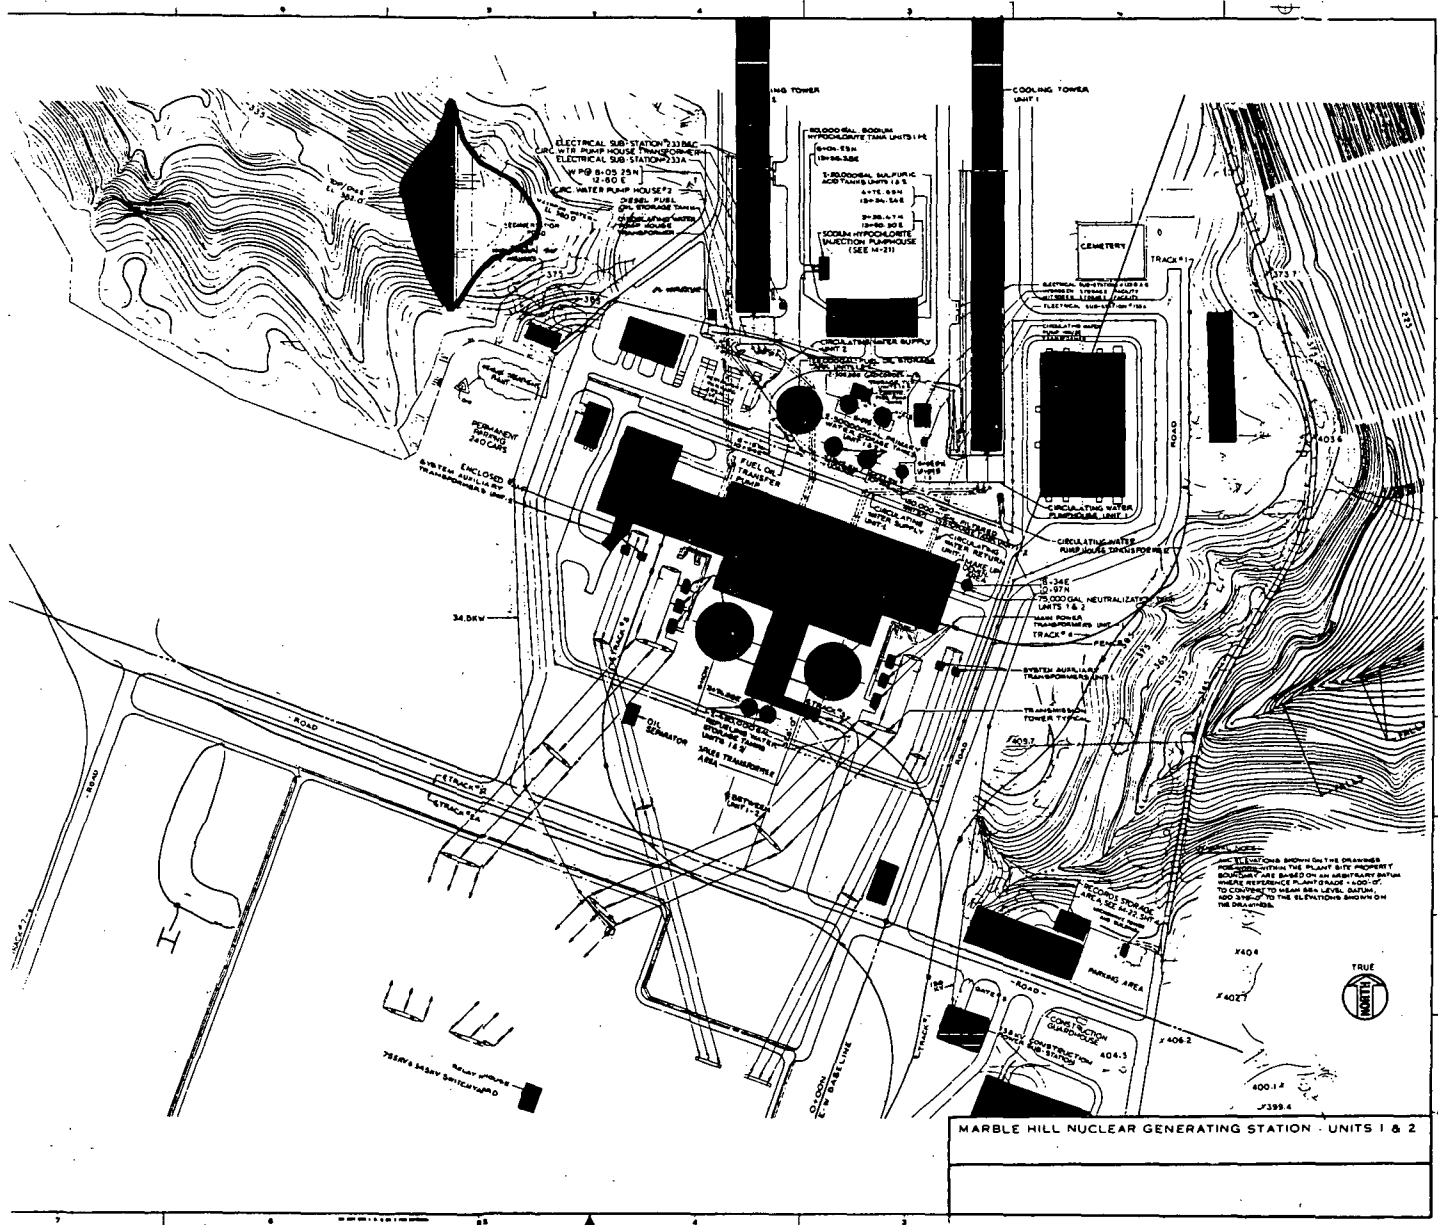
Plot Plan of Major Plant Structures (Source: Marble Hill FSAR 1982).
